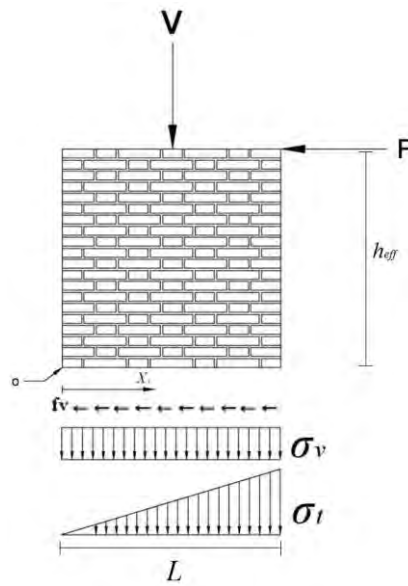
Masonry wall under horizontal lateral loading [44].
